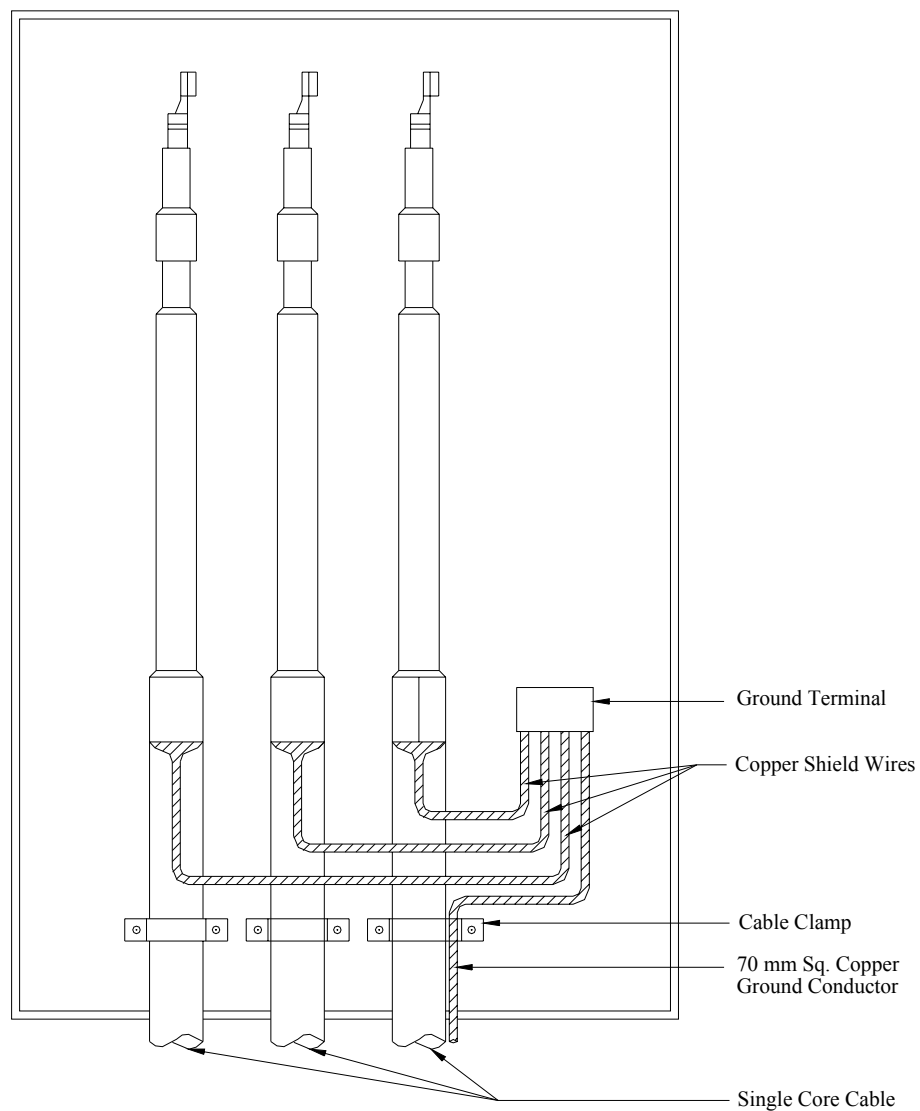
TYPICAL GROUNDING DETAILS INDOOR TERMINATION OF
